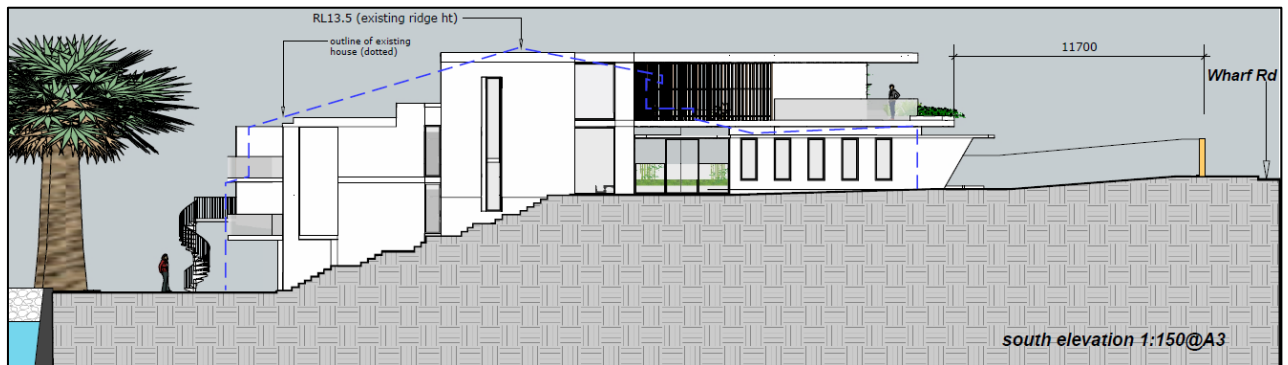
Southern elevation of proposal (existing dwelling shown in blue dotted line)
